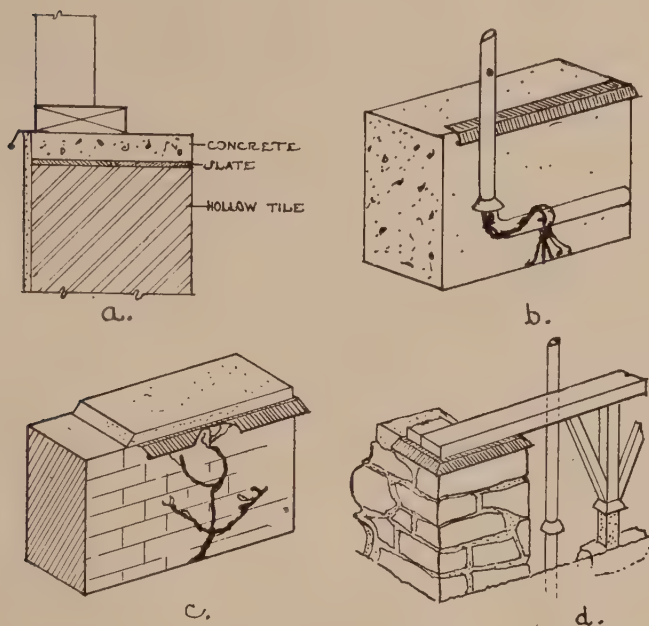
The insulation of hollow and solid masonry foundation units against termites: (a) foundation wall of hollow tile surfaced with stucco, showing metal termite shield in place and how the top of the wall is capped with sheet slate and concrete; (b) concrete wall with termite shield at top and horizontally laid piping fitted with metal shield above bend to shut off termite tubes; (c) brick wall with termite shield and capped with concrete; note how the shield mechanically blocks the earth-like shelter tubes of the termites; (d) stone wall with termite shield and capped with concrete and wooden posts insulated from the ground with base stone and concrete block. Note termite shield on post and piping.
